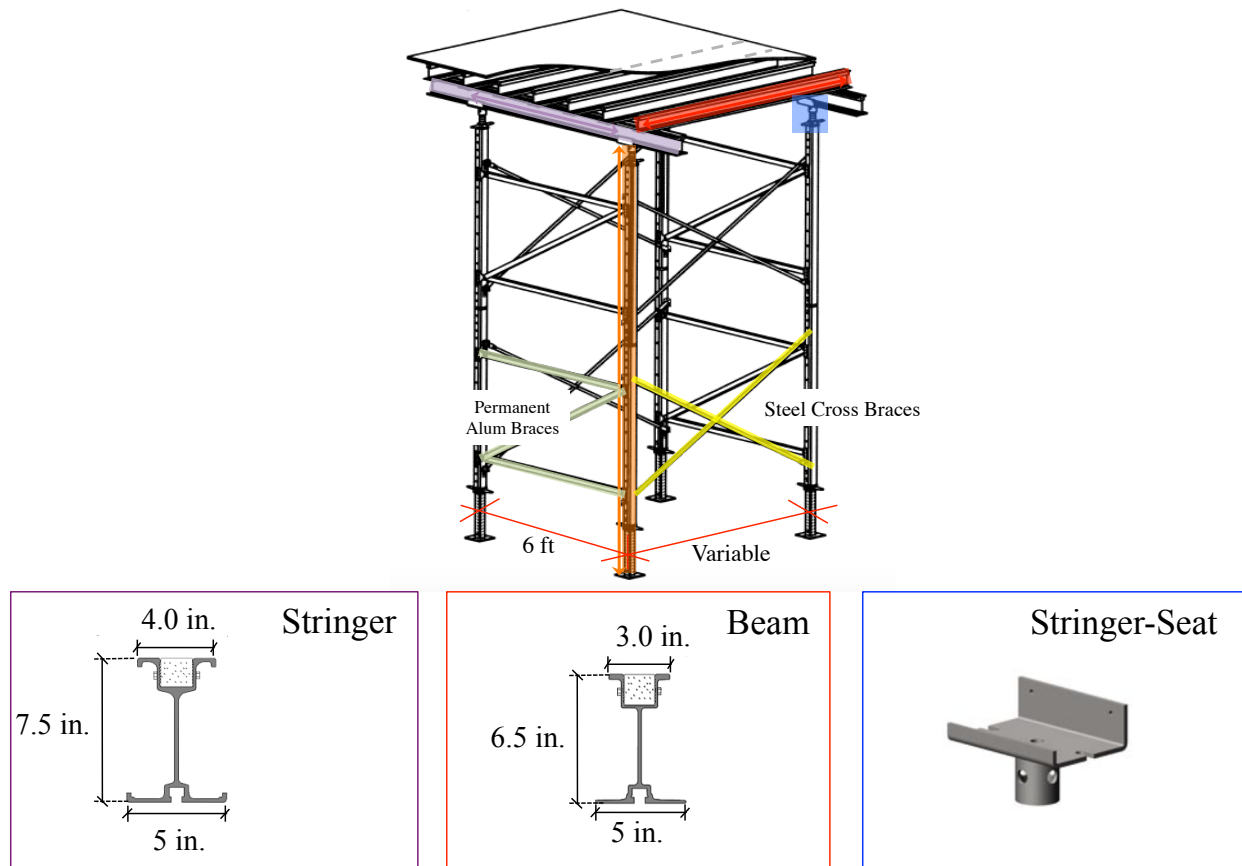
Typical Shoring Tower, Cribbage and Formwork, Isometric View
